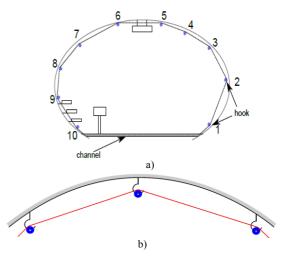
a) Cross section of FO installation. b) Method of attachment of FO cable: hook-and-pulley system.
